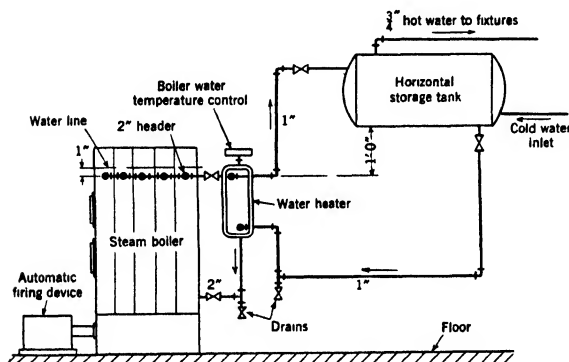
INDIRECT WATER HEATER MOUNTED ON SIDE OF BOILER
